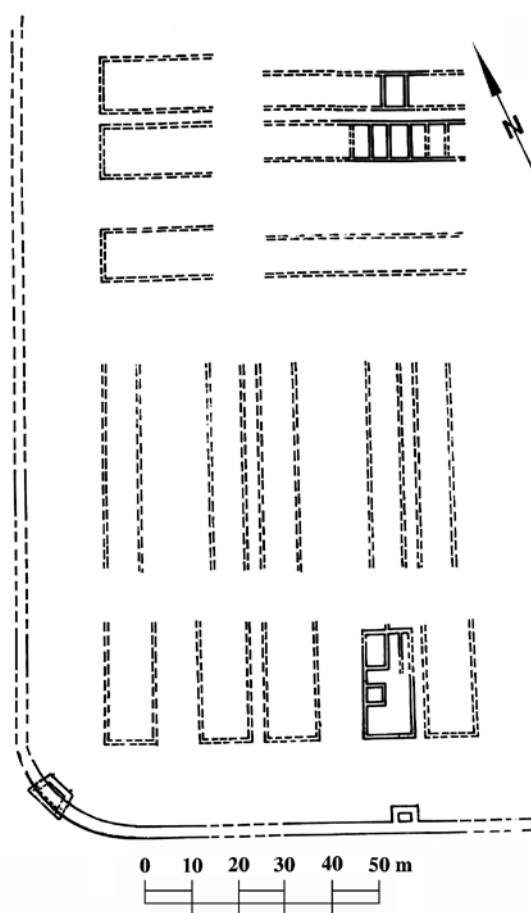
Reconstruction of buildings in the southwest corner of the fortress.
